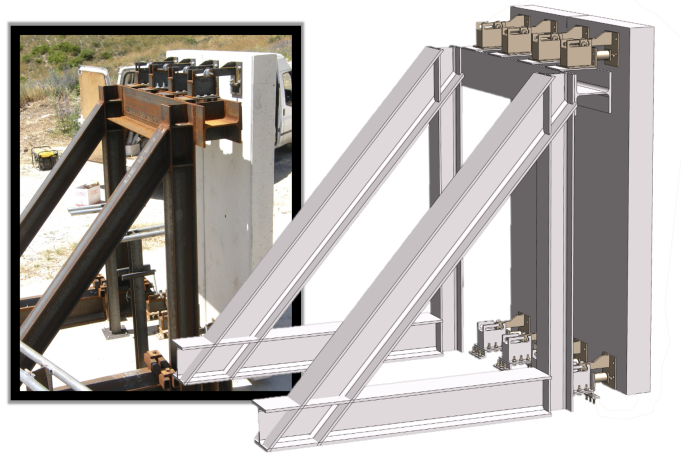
Representation of the assembly formed by over ten different parts using SolidWorks.
